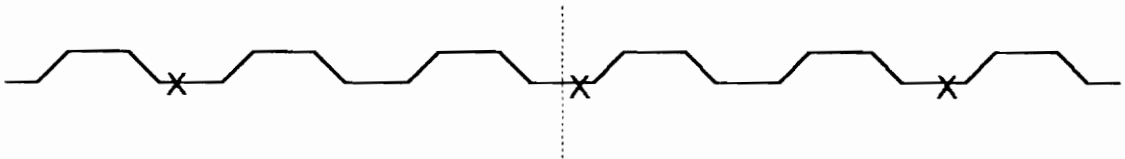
SDI-3/20-3-10 Concrete Strain Gage and Shear Stud Locations
